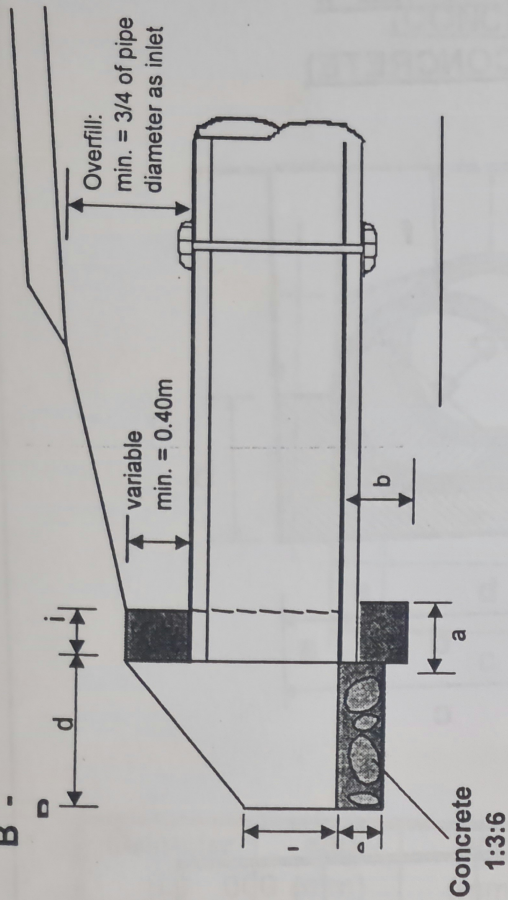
HEADWALL TYPE 4 (FOR ACCESS CULVERTS)
